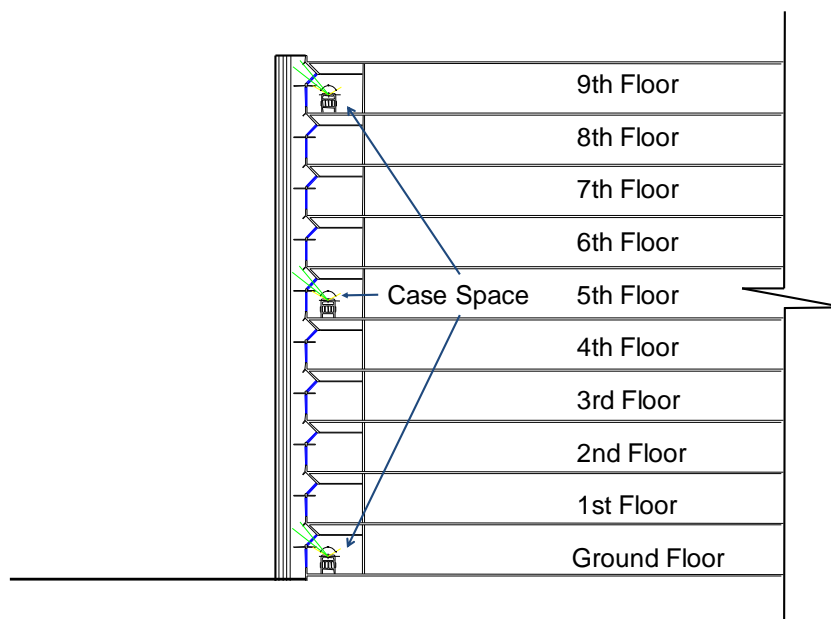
Section shows the alternative locations of case space in a 10 storey hospital building for south orientation.
